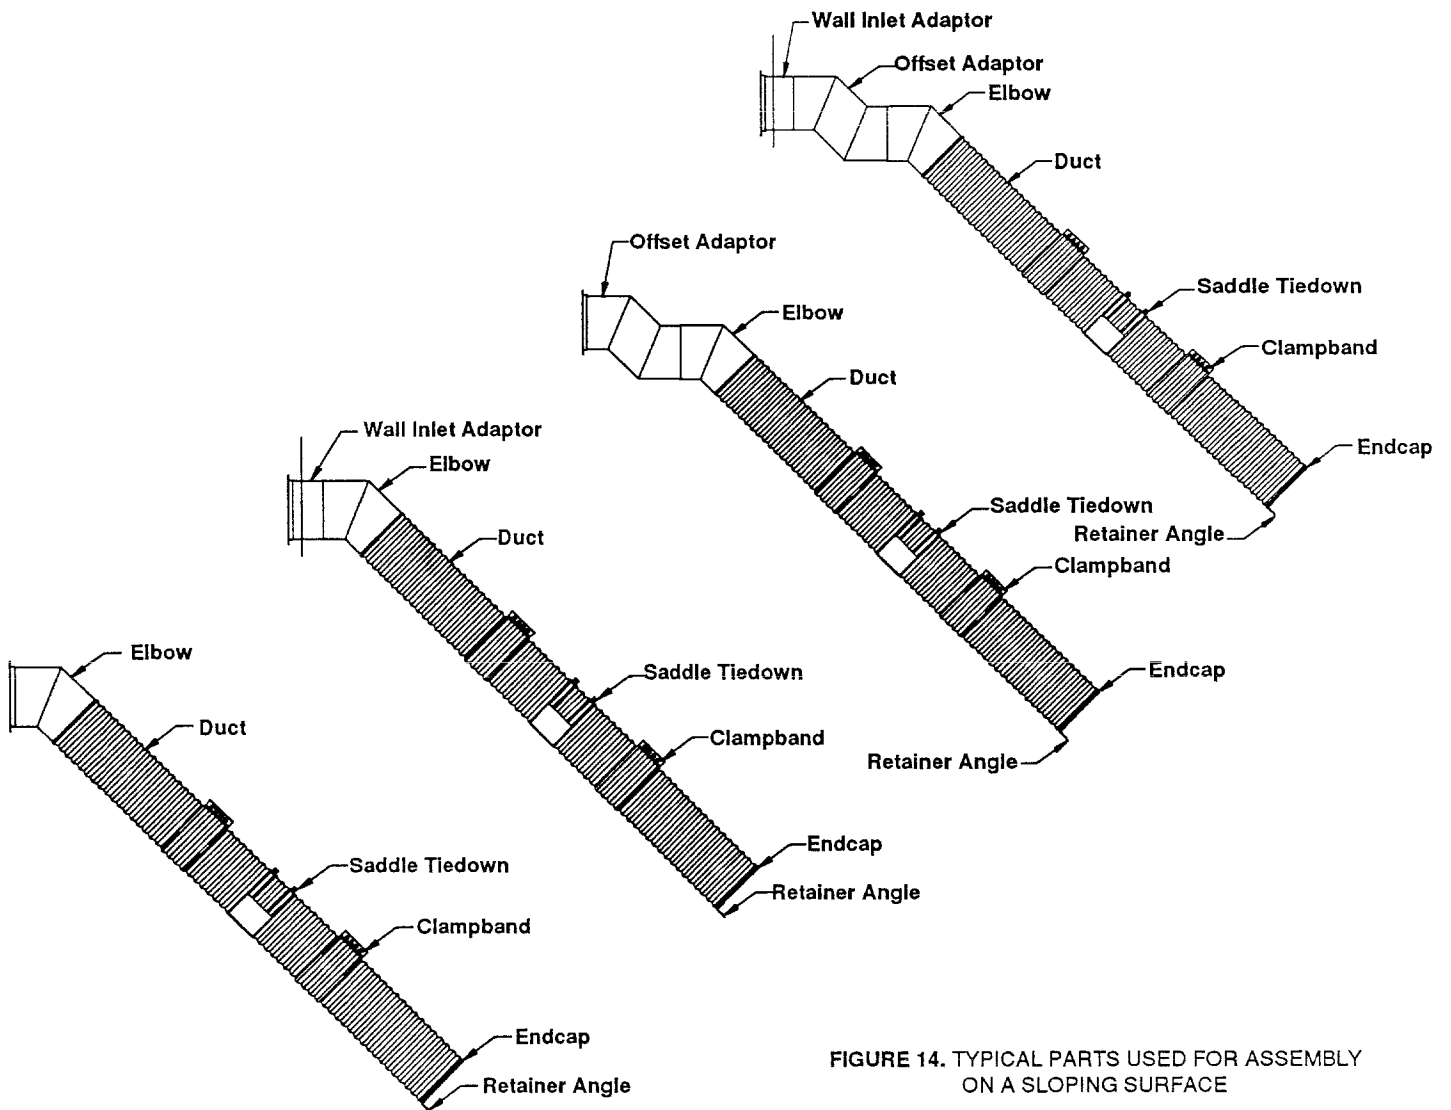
TYPICAL PARTS USED FOR ASSEMBLY ON A SLOPING SURFACE
